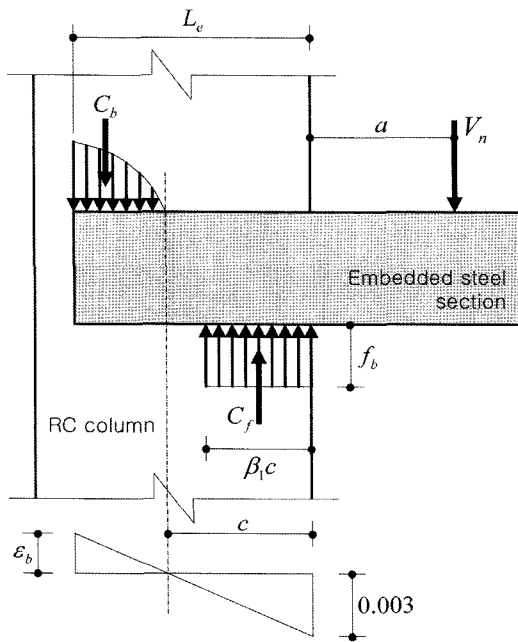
Assumed stresses and strains in concrete adjacent to embedded steel section
